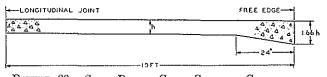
SLAB PANEL CROSS-SECTION COMPLETELY BALANCED FOR LOAD STRESSES.
